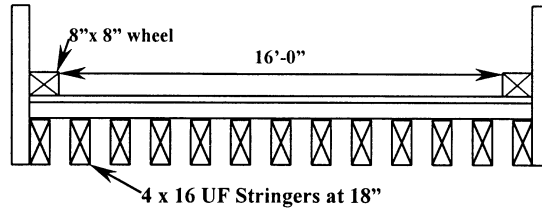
Typical cross section detail of simply supported timber bridge example.
